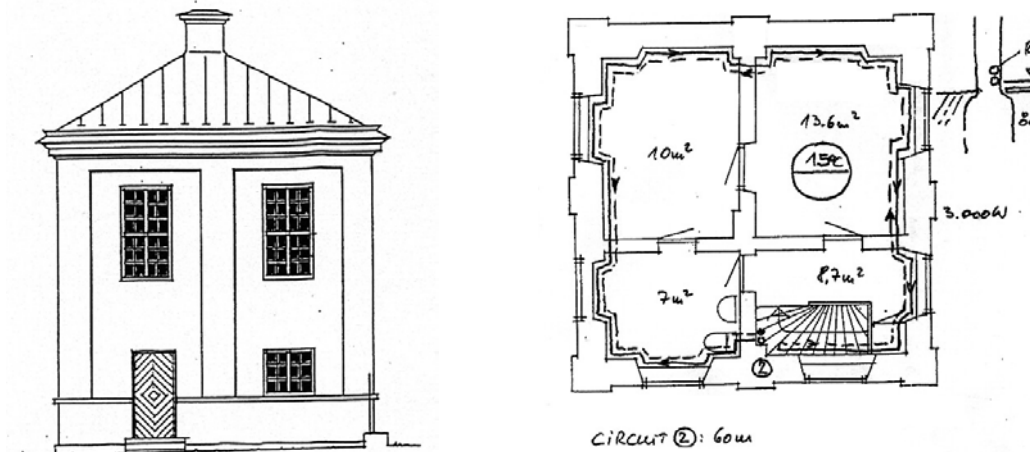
West Salsta pavilion, plan of wall tempering, [10].
